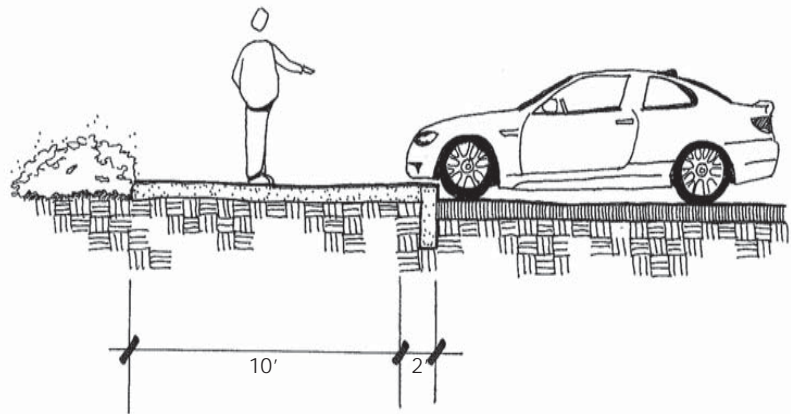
Parking Lot Curb - 6" Curb Adjacent Primary Pedestrian Walk
